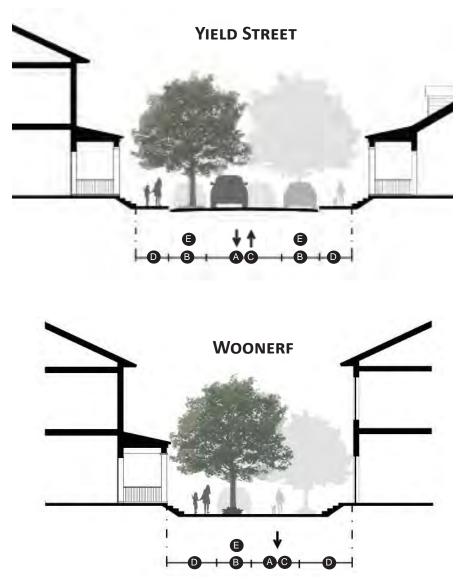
B.8: Sample C5 Yield Street (top) and WOONERF (pedestrian-dominant street) (bottom)
